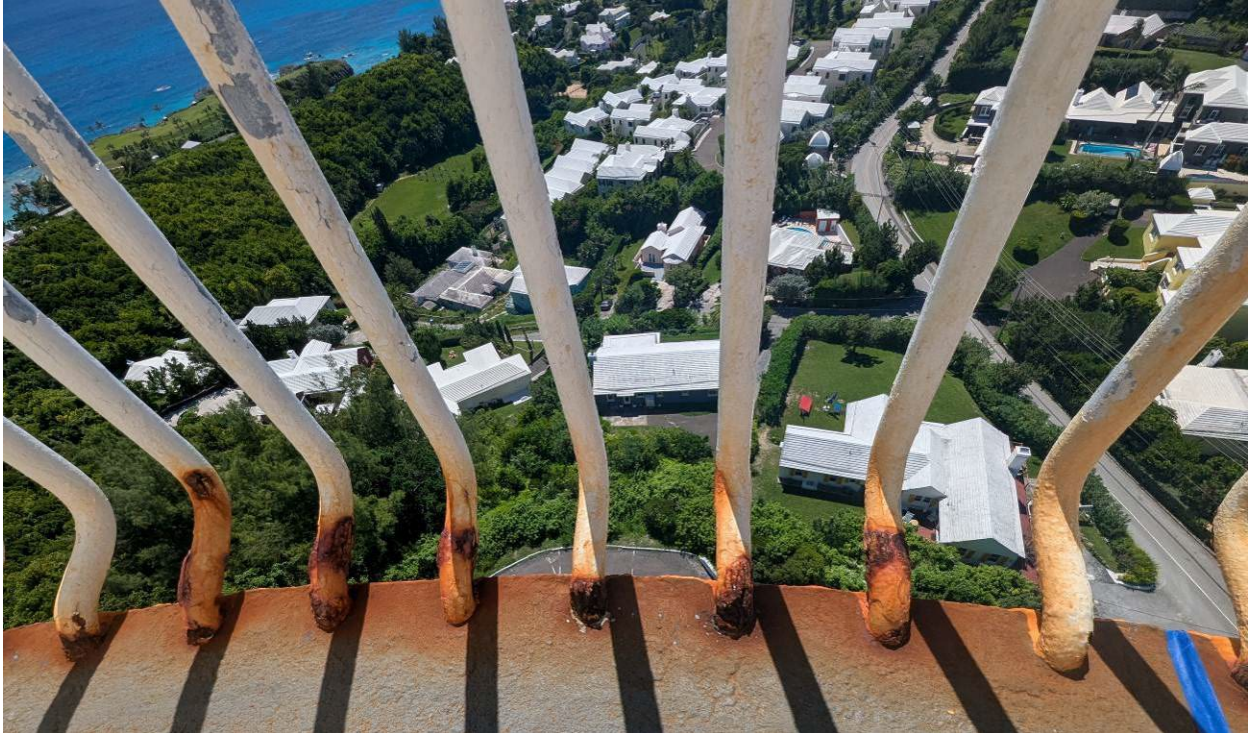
Lower railings connection to platform in Section 5 (Bars 081-089)
